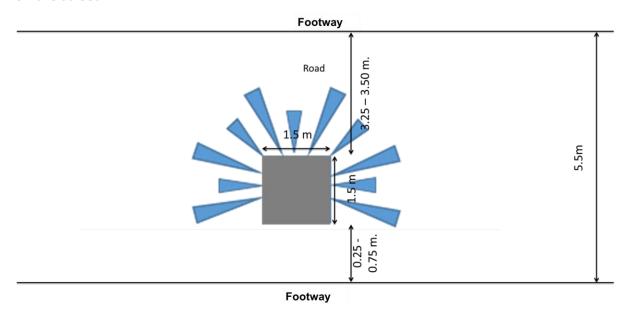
Symington Road – Design of Community Corner, Carriageway details
